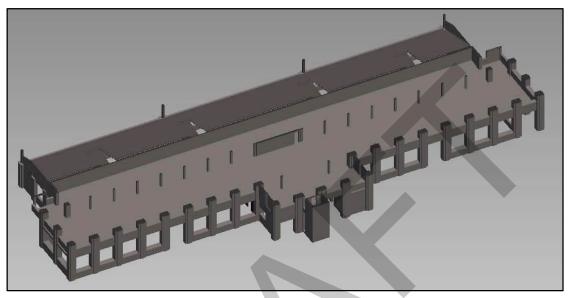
Cutaway showing walls and columns at the first floor level at GNS
